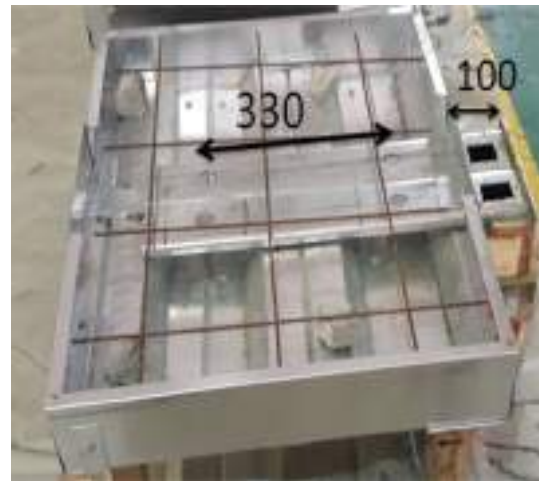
Cold-formed steel lipped C channel beam fabrication for specimen back-to-back without holes
